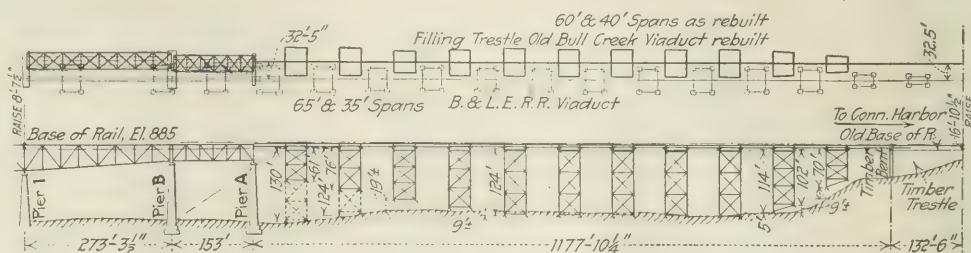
OUTLINE ELEVATION OF NEW ALLEGHENY RIVER BRIDGE OF BESSEMER & LAKE ERIE R.R.
